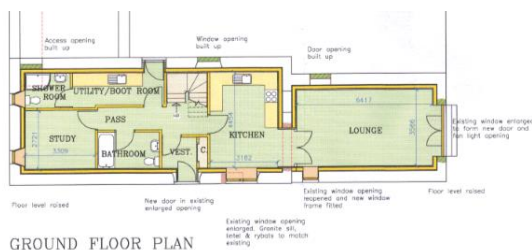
Proposed floor plans (planning dwg 1822/06)
